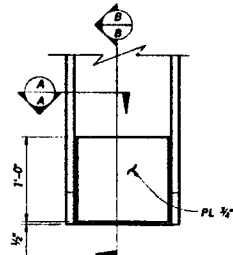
DETAIL "A" (Showing Plan View of a 30° Skewed Abutment)
